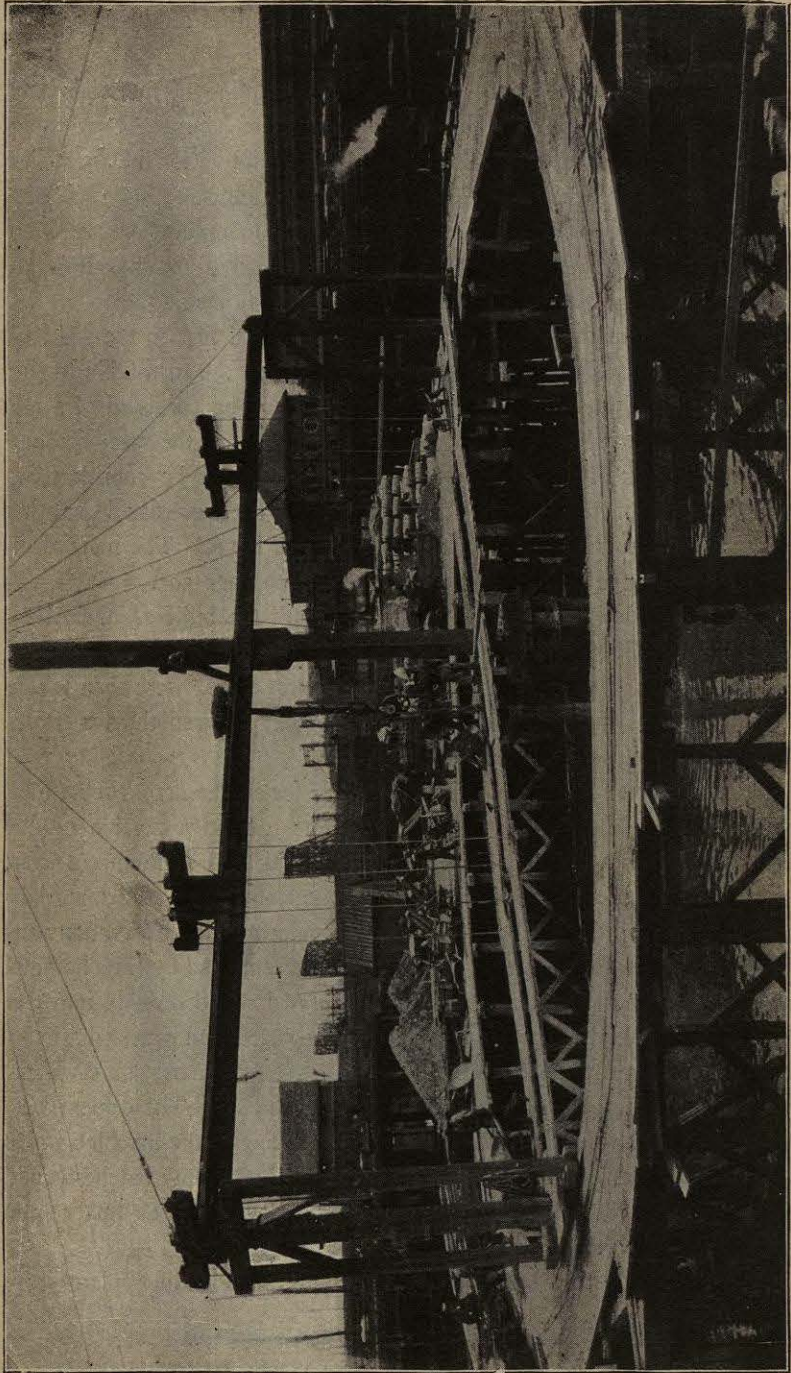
Depositing Concrete of Draw Foundation Pier, Charlestown Bridge. (See p. 269.)
